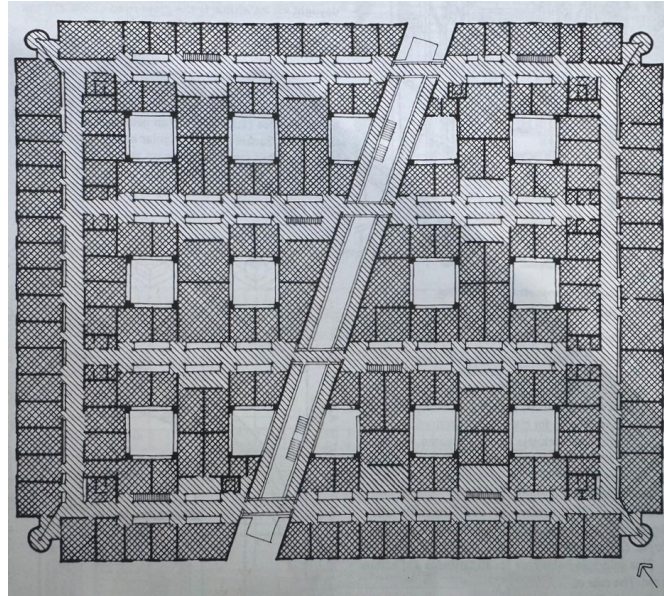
Second Floor Plan, Reitestrasse Building, Bern, Switzerland, Bureau d'architecture (DeKay & Brown, 2014)
